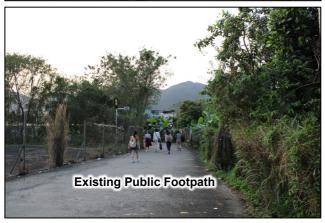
Existing Public Footpath Connecting Light Rail Lam Tei Station and the Village House Developments to the Further North-west
